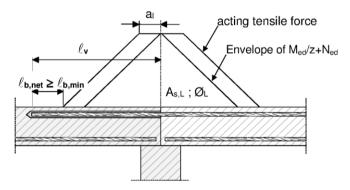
Anchoring of reinforcement to cover line of acting tensile force
